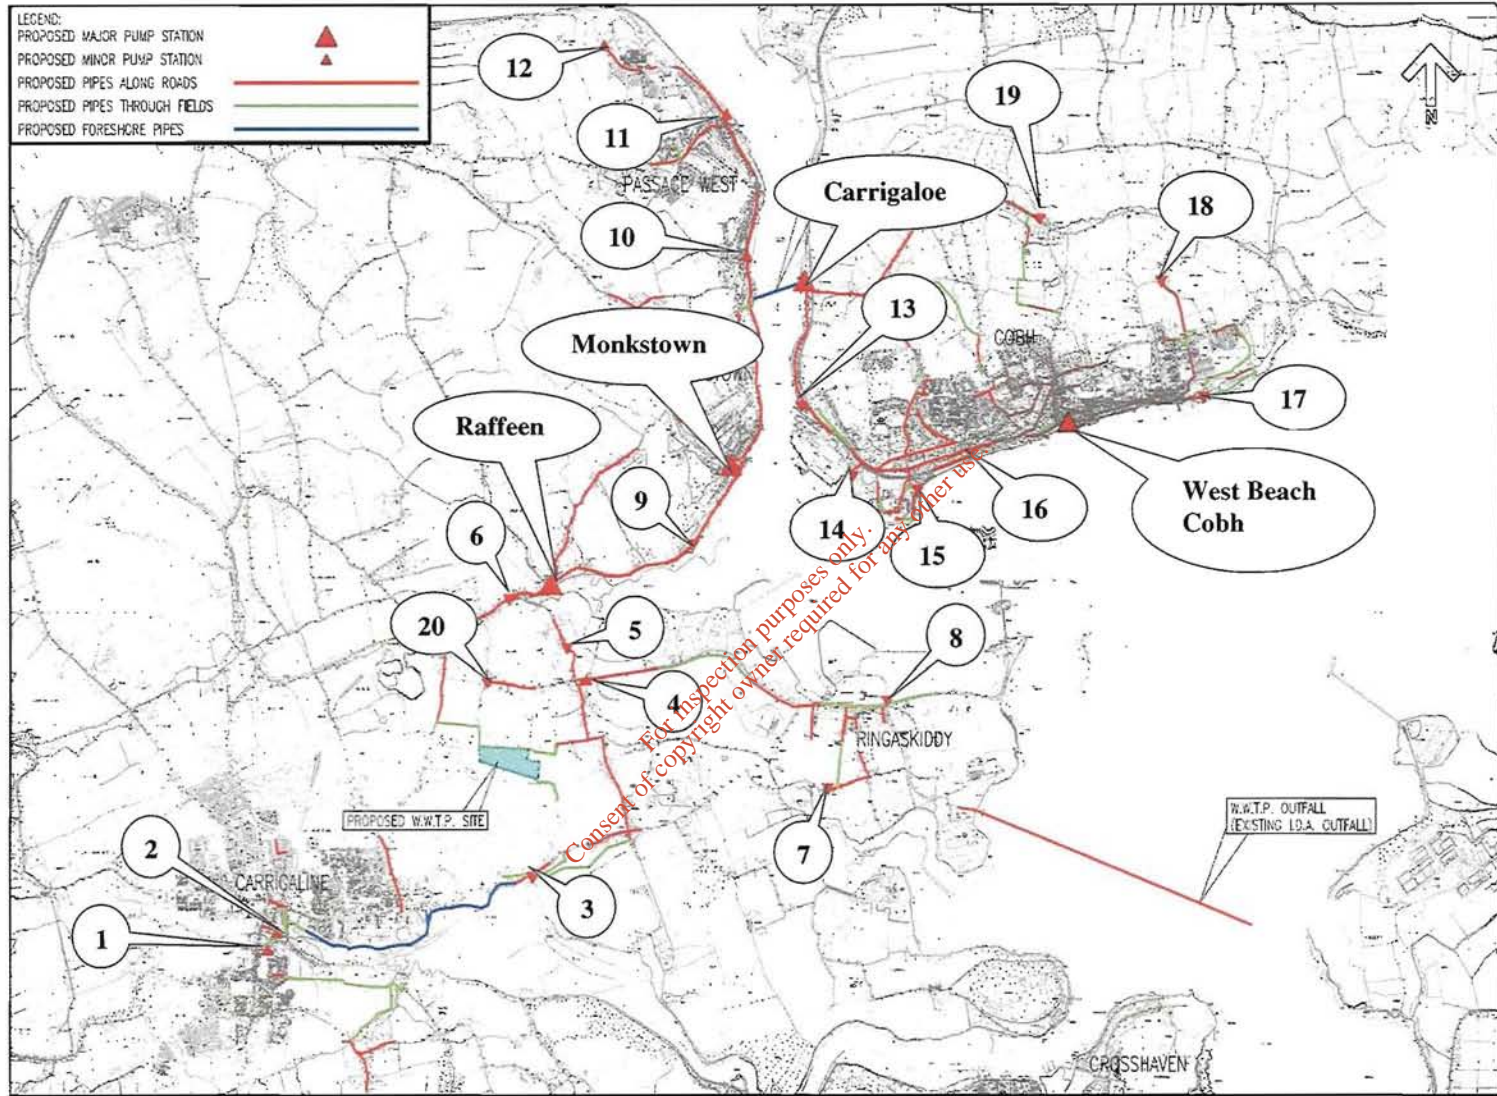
Layout of Cork Lower Harbour Main Drainage Scheme, showing sewerage network, and major pumping station locations at Raffeen, Monkstown, Carrigaloe, and West Beach where detailed noise surveys were carried out. Also shown are the minor pumping station locations 1 to 20, where short-duration noise surveys were carried out
